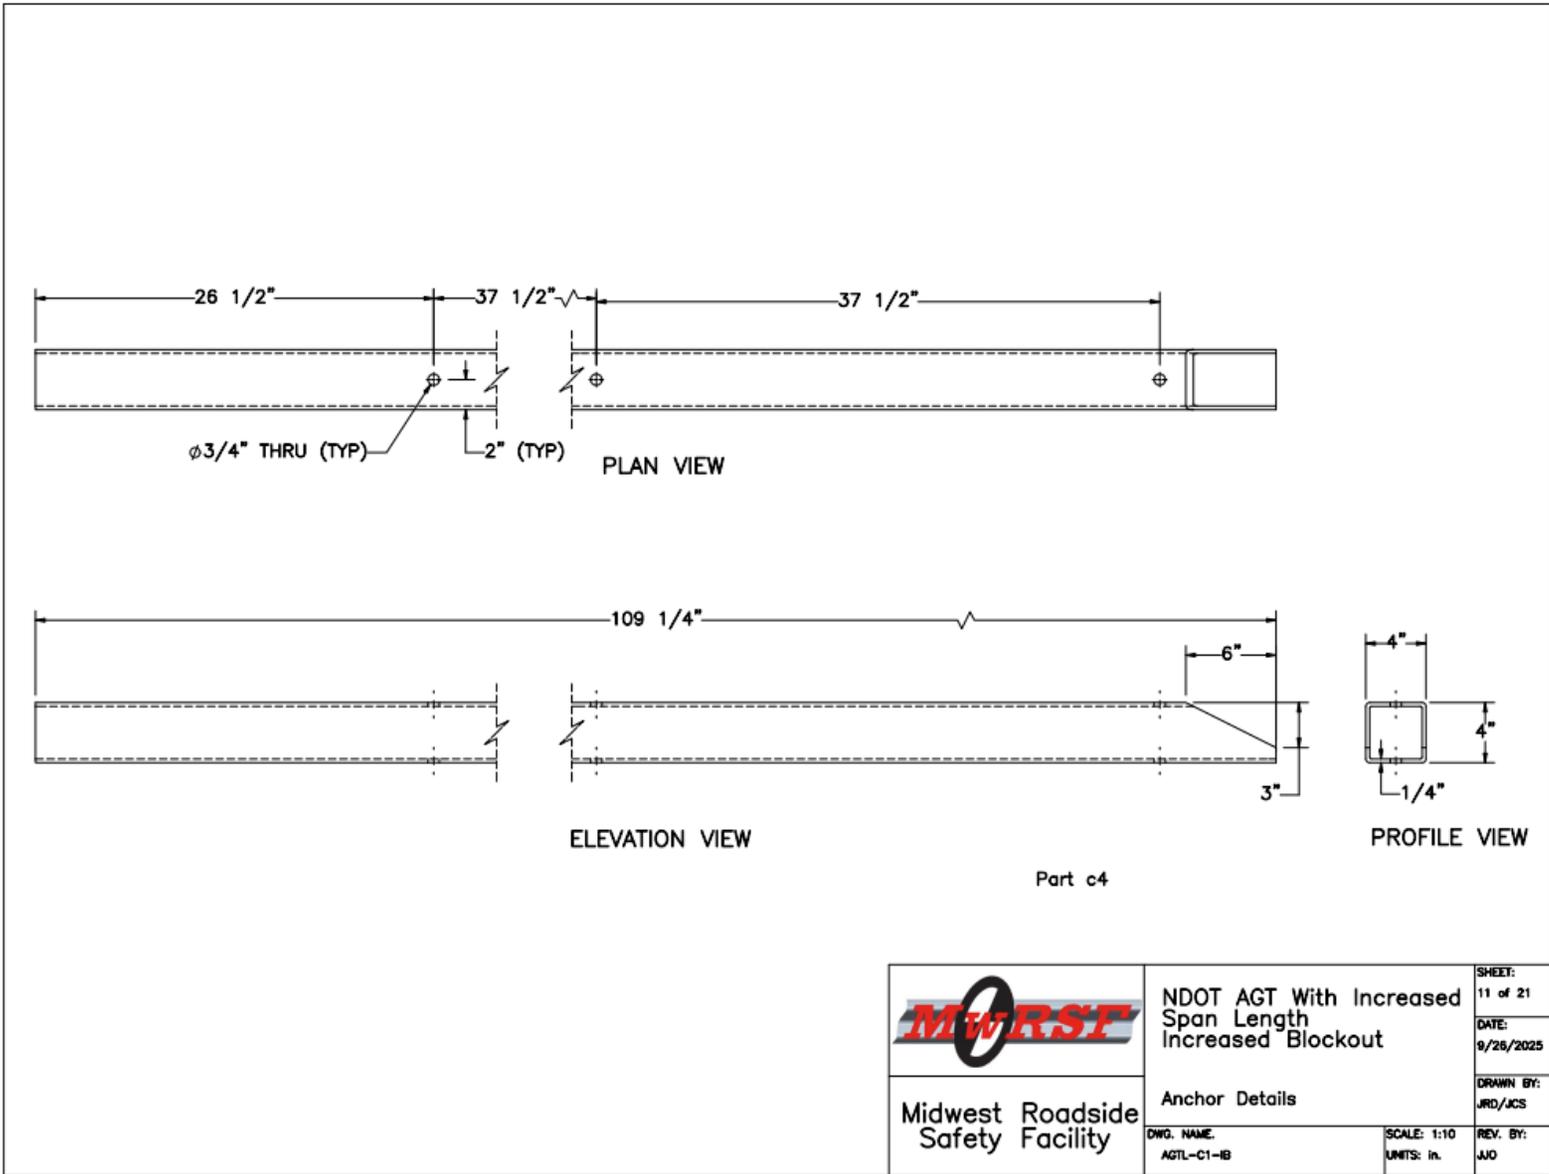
NDOT AGT With Increased Span Length, Anchor Details, Concept 1
